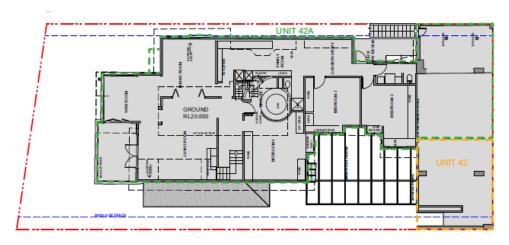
Existing Ground Floor Plan. (Source: Quattro Architects)
